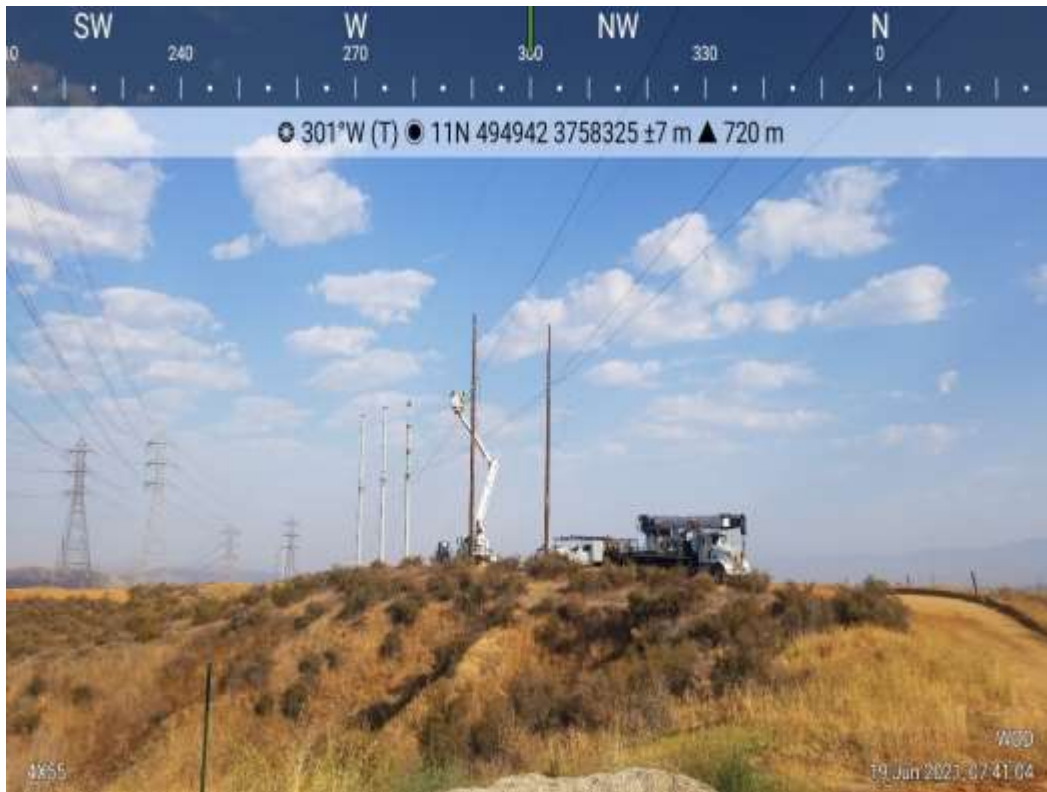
Wire wreck-out activities at Construction Area 4X44, Segment 4 (June 19, 2021) (Photo courtesy of SCE).
